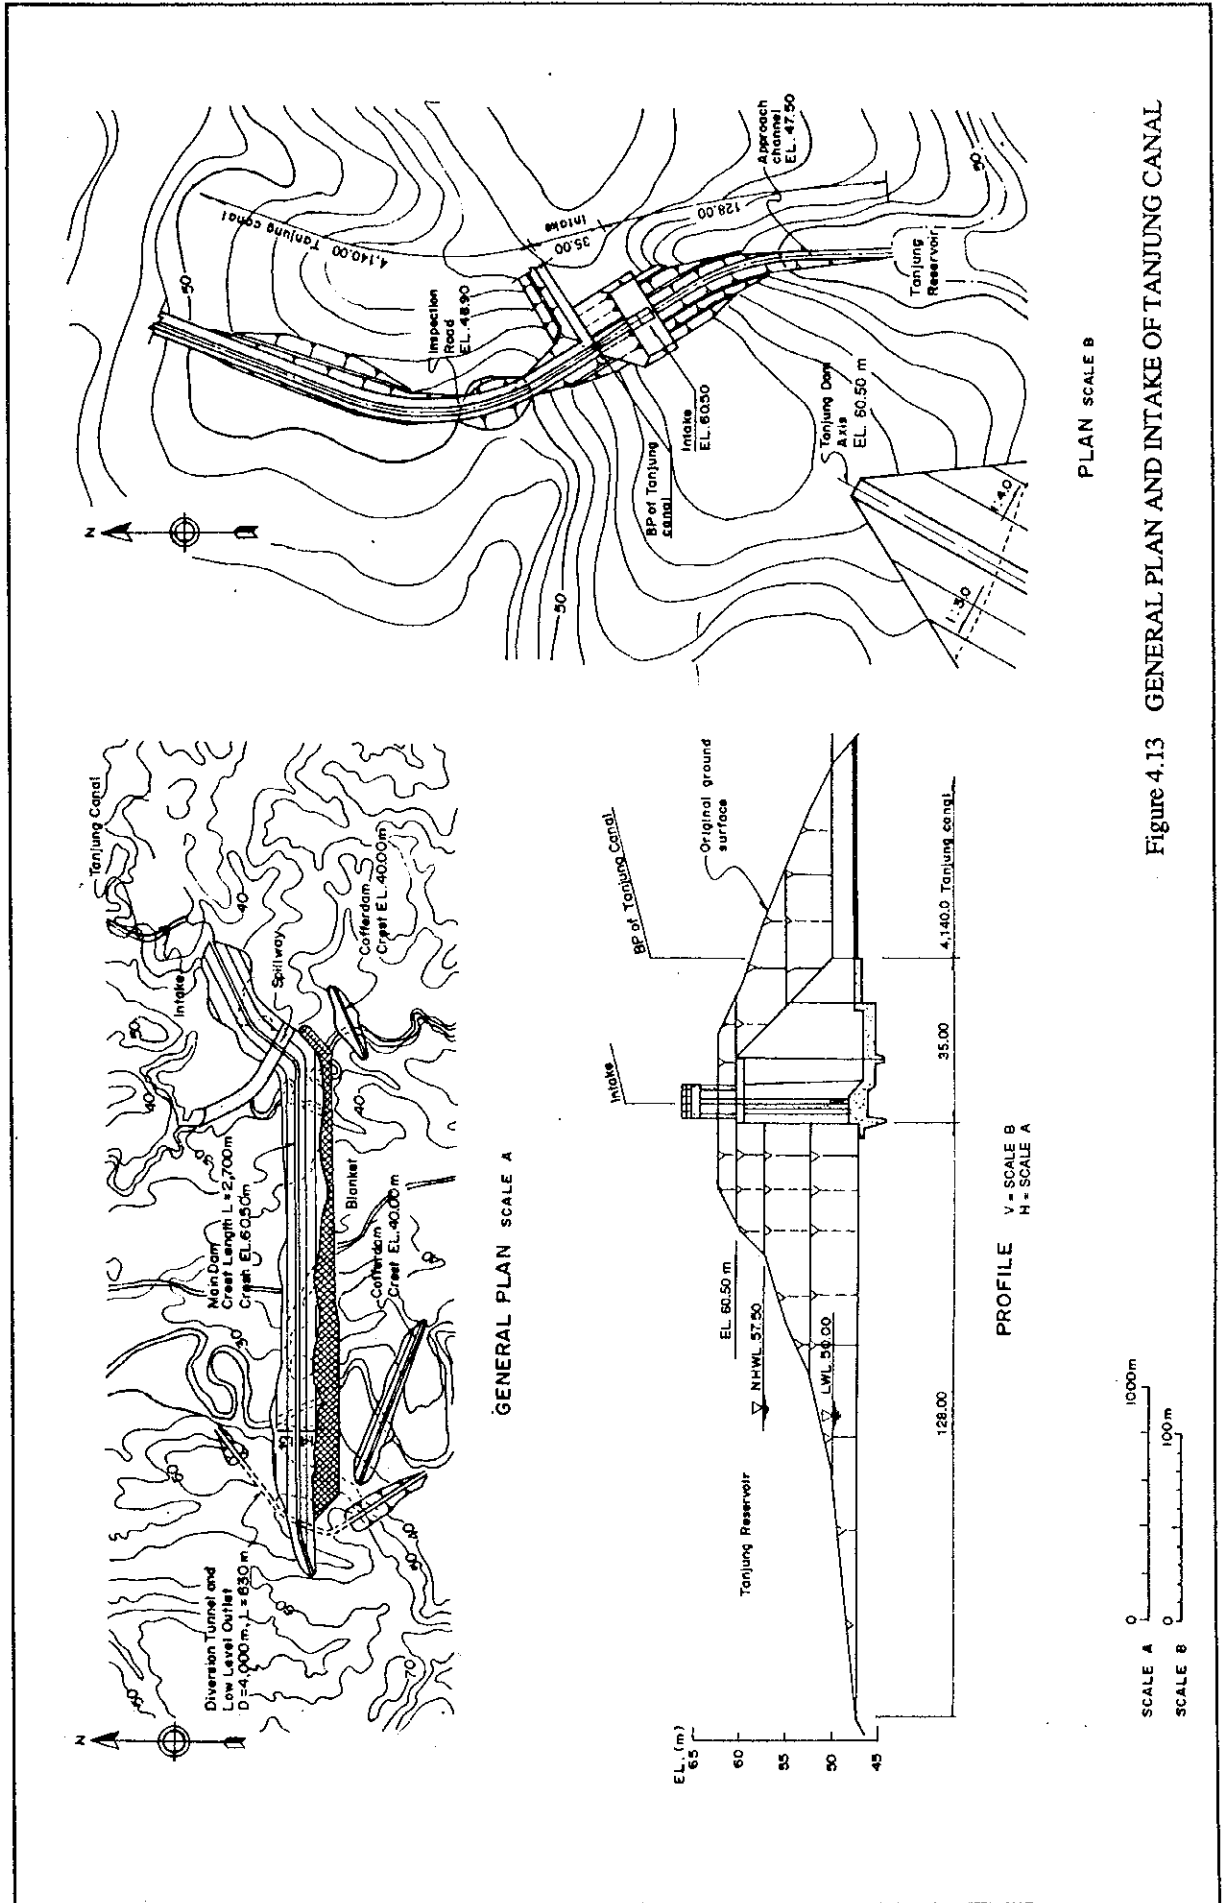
GENERAL PLAN AND INTAKE OF TANJUNG CANAL
